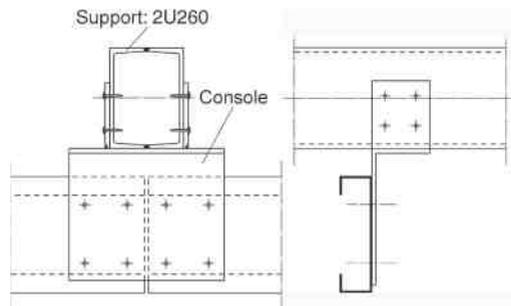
Example of a connection (console fixed to column) consisting of a group of fasteners
